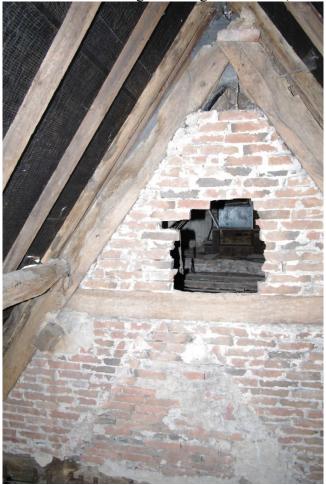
East gable over Room 13 seen from Room 18 Looking east. Note pegged apex and scar from earlier lower gable
